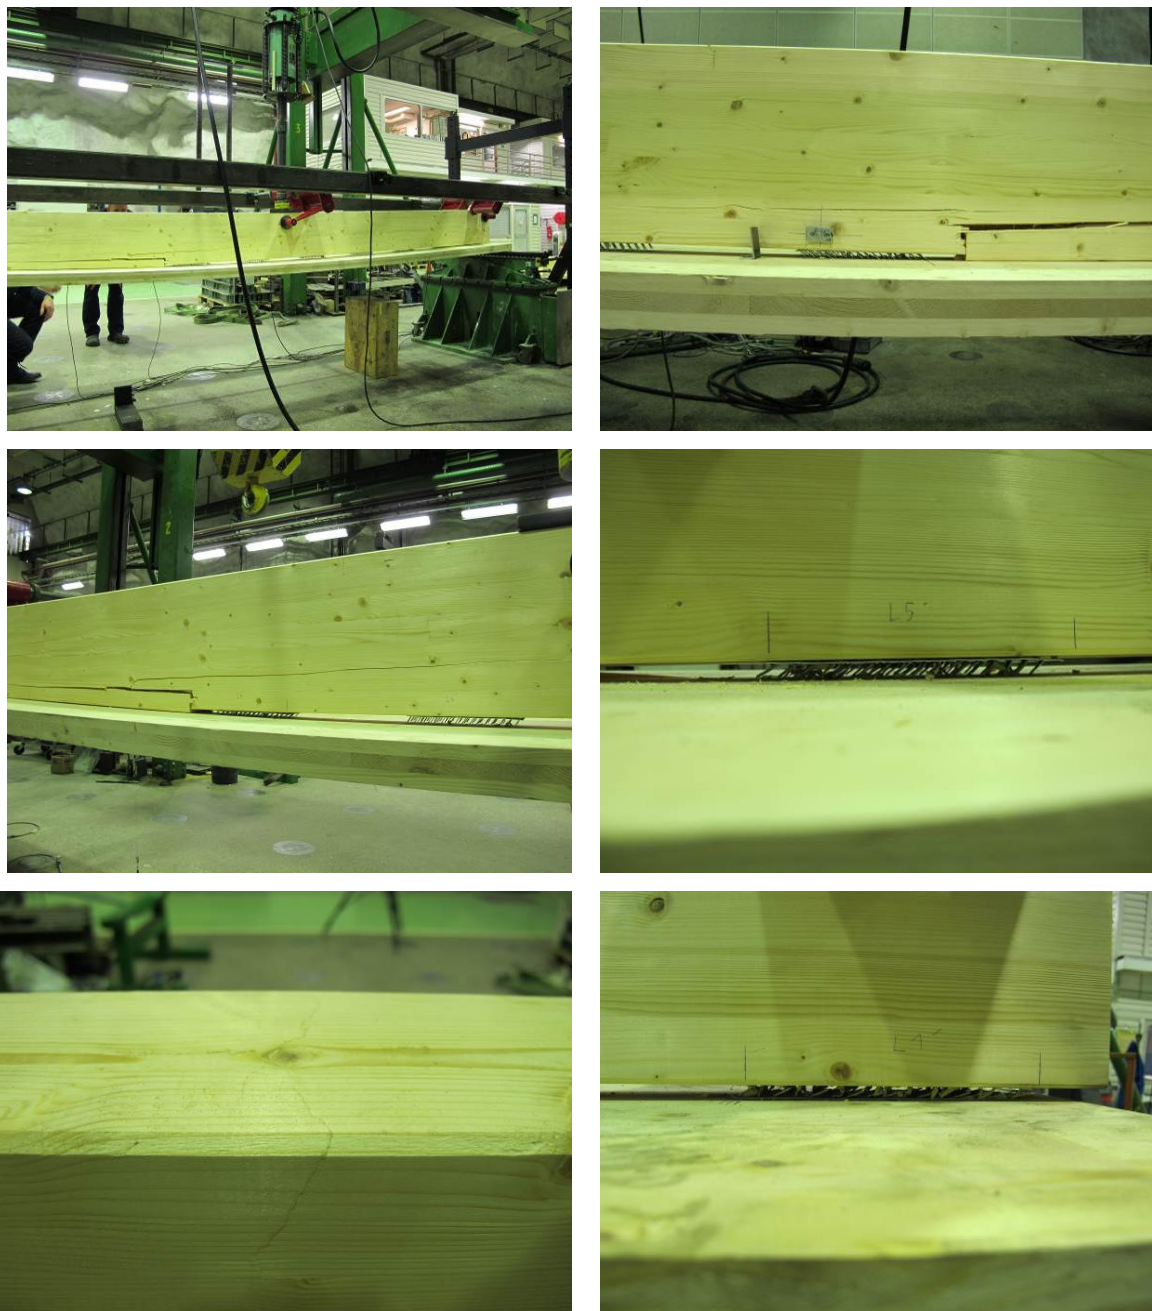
Pictures of beam specimens after failure (Series B2_NP)
